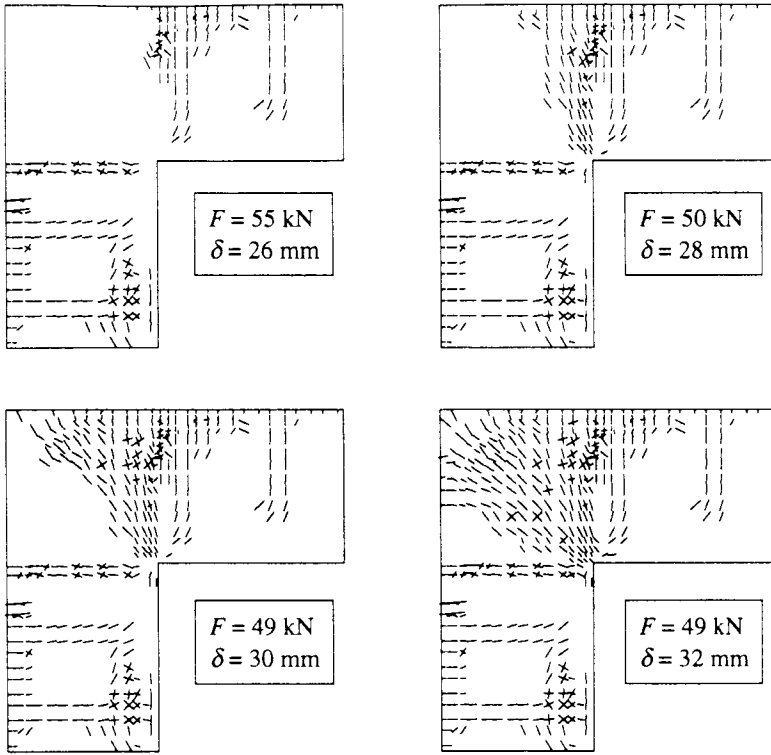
Crack propagation in the corner area for the conventional reinforcement detailing at different load levels.
